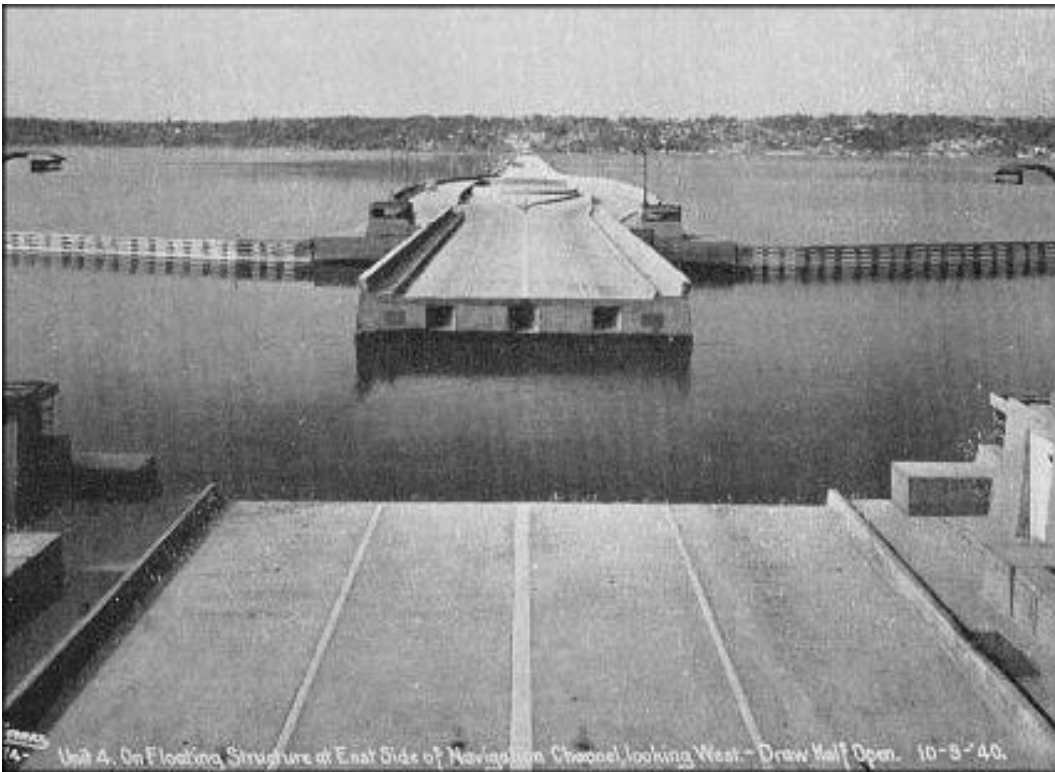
Drawspan of the Original Lacey V. Murrow Bridge, Looking West Toward Seattle
